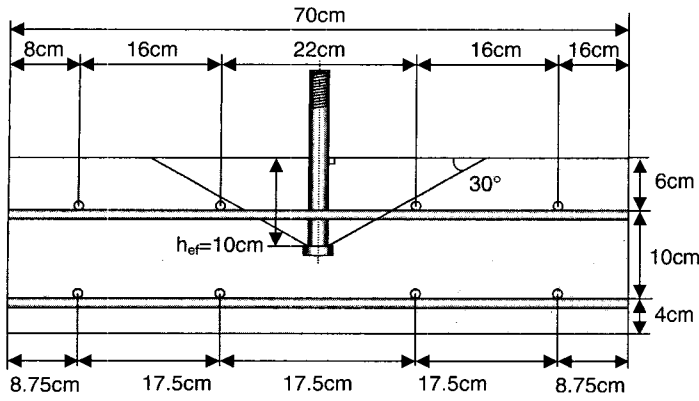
Reinforcements and anchor placement (cross-sectional view)
